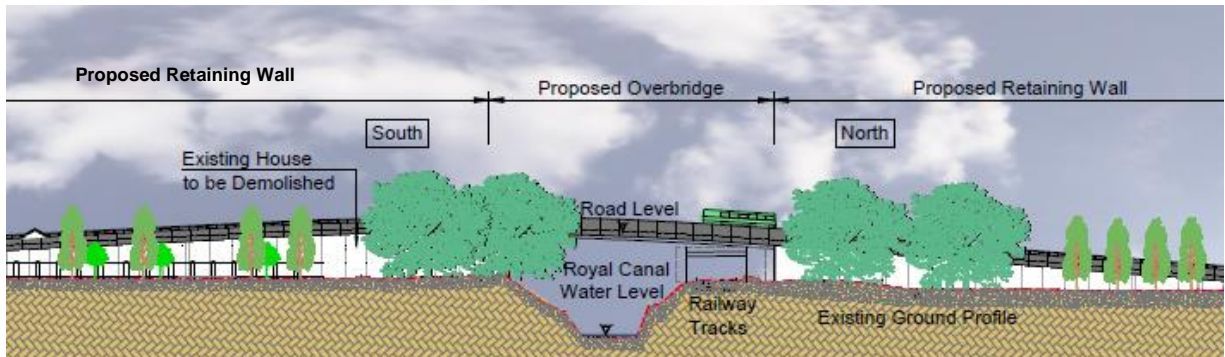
Coolmine Emerging Preferred Option: Road Bridge - Sectional Elevation
